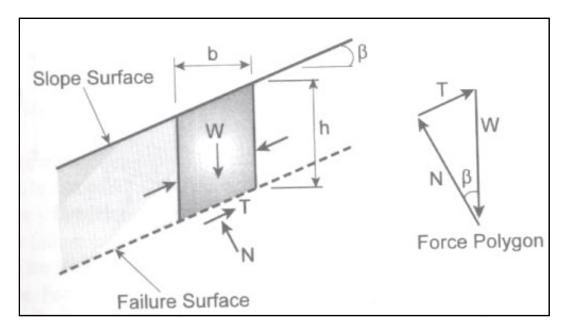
Infinite slope failure in dry sand (Source: Abramson et al. 2002)
